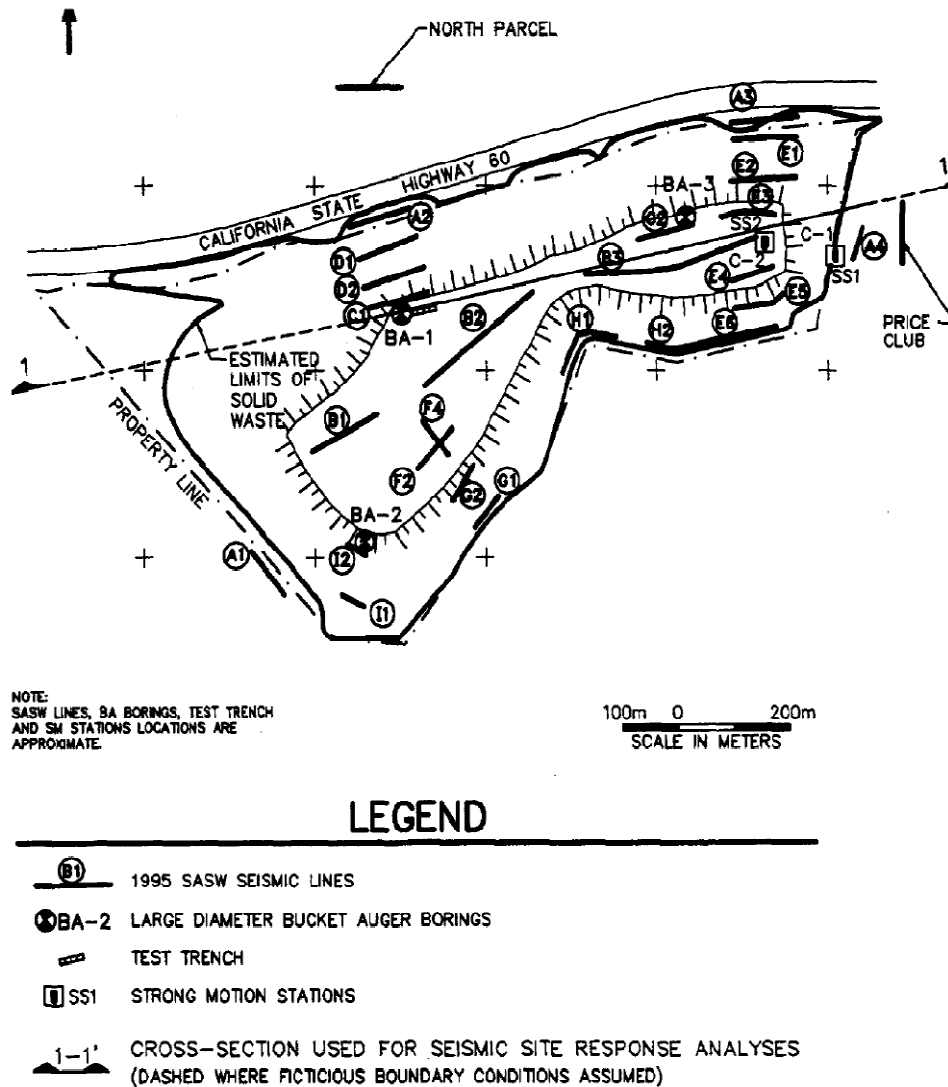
Plan view of the OII landfill showing the testing borings (Matasovic and Kavazanjian 1998)
